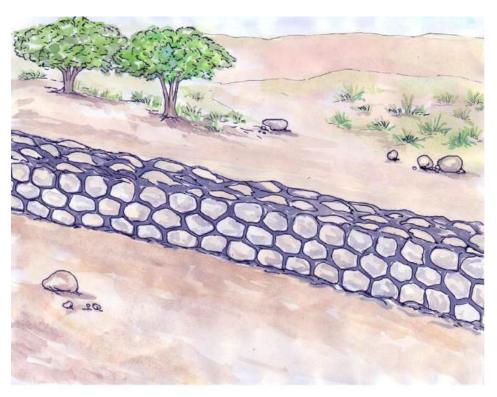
Never build a straight long wall without buttresses: it will not be stable and will not last.
